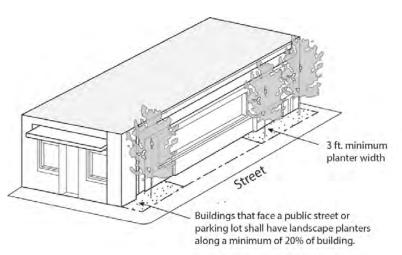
(C): BUILDING PERIMETER LANDSCAPING
